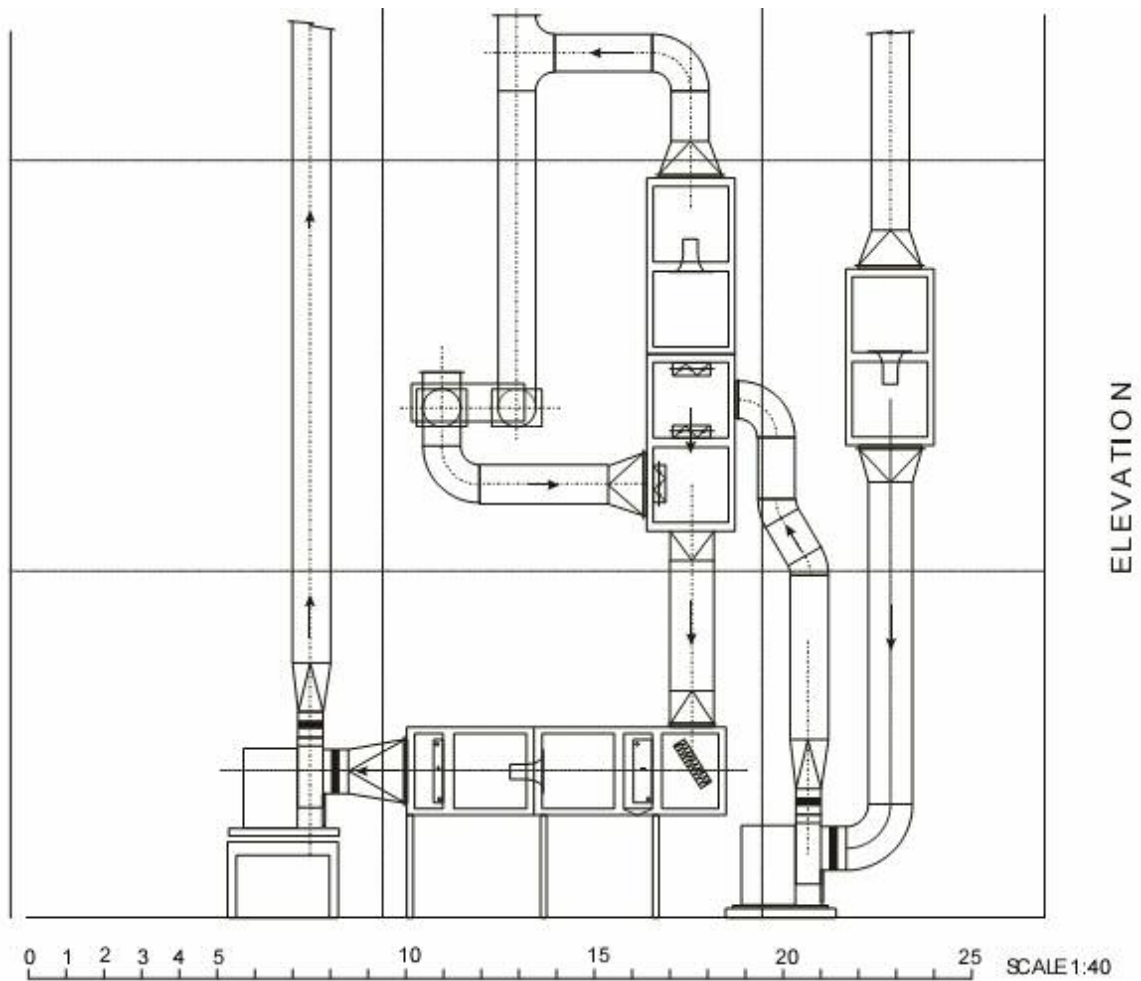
Elevation view of the air handling system (Fisher and Chantrasrisalai 2006)
